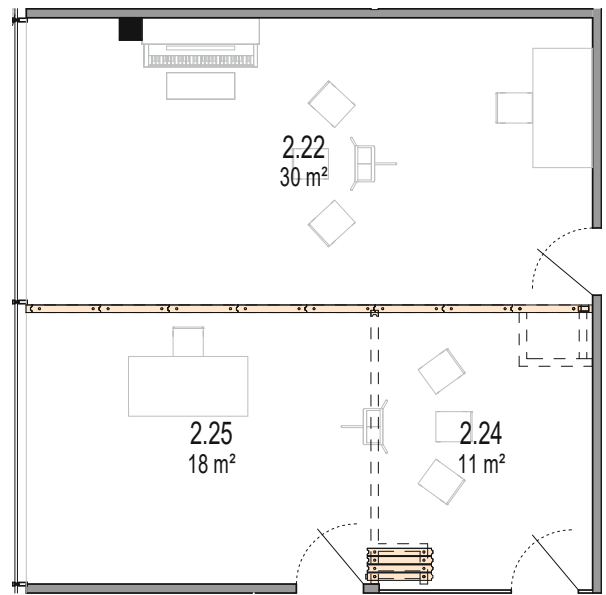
Flexible classrooms with partially open moveable walls-floorplan
